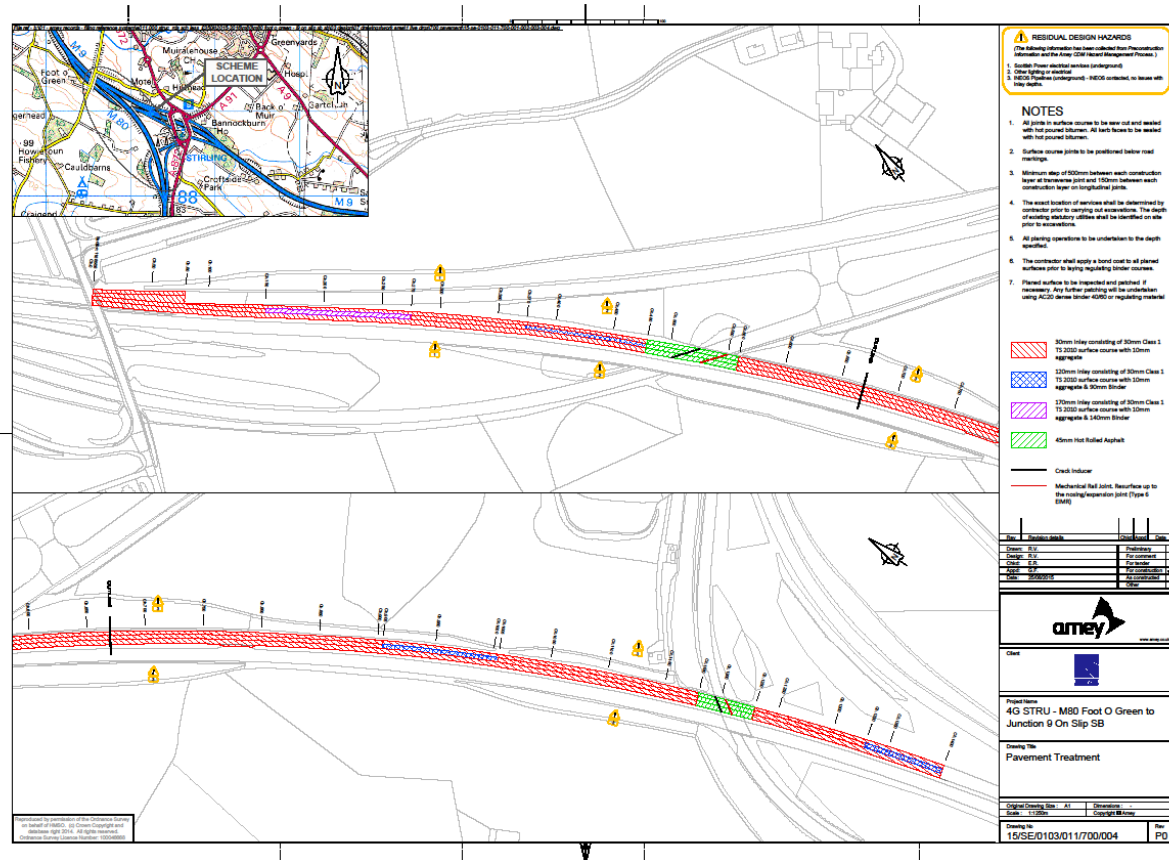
Detailed Location Plan of M80 Trial Site (Part 1)
